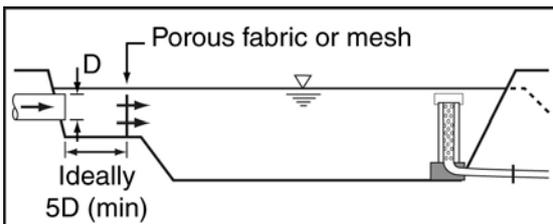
(b) – Typical layout of inlet chamber with opposing inlet pipe (Type C basin)
